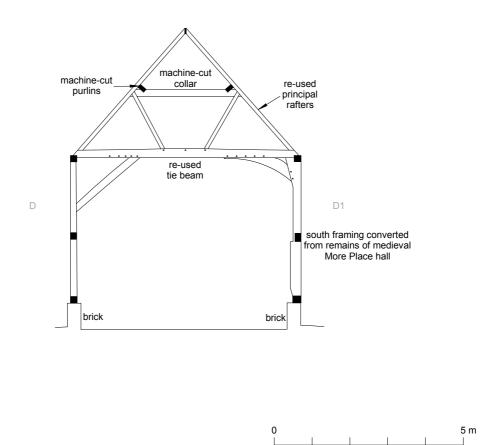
Structure 6, 17th-century barn cross-section of truss D.
